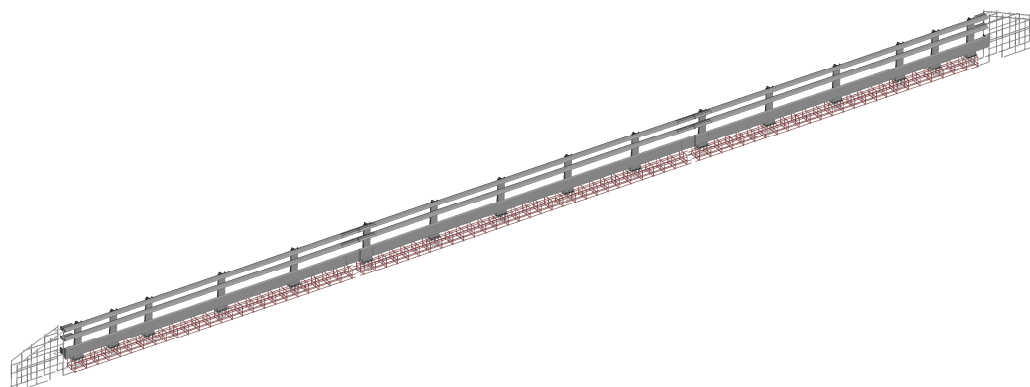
Beam elements for the reinforcing bars embedded in the concrete parapet of the TMBR.
